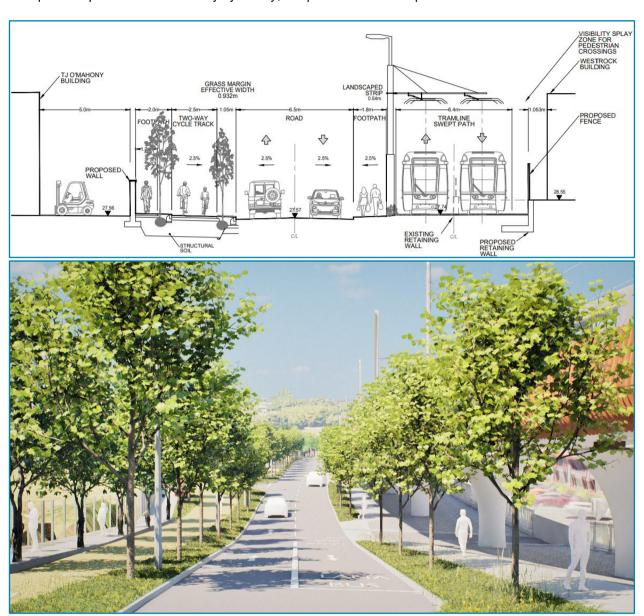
Proposed Cross-Section of Broombridge Road (looking northwards) (15 years postconstruction date)
